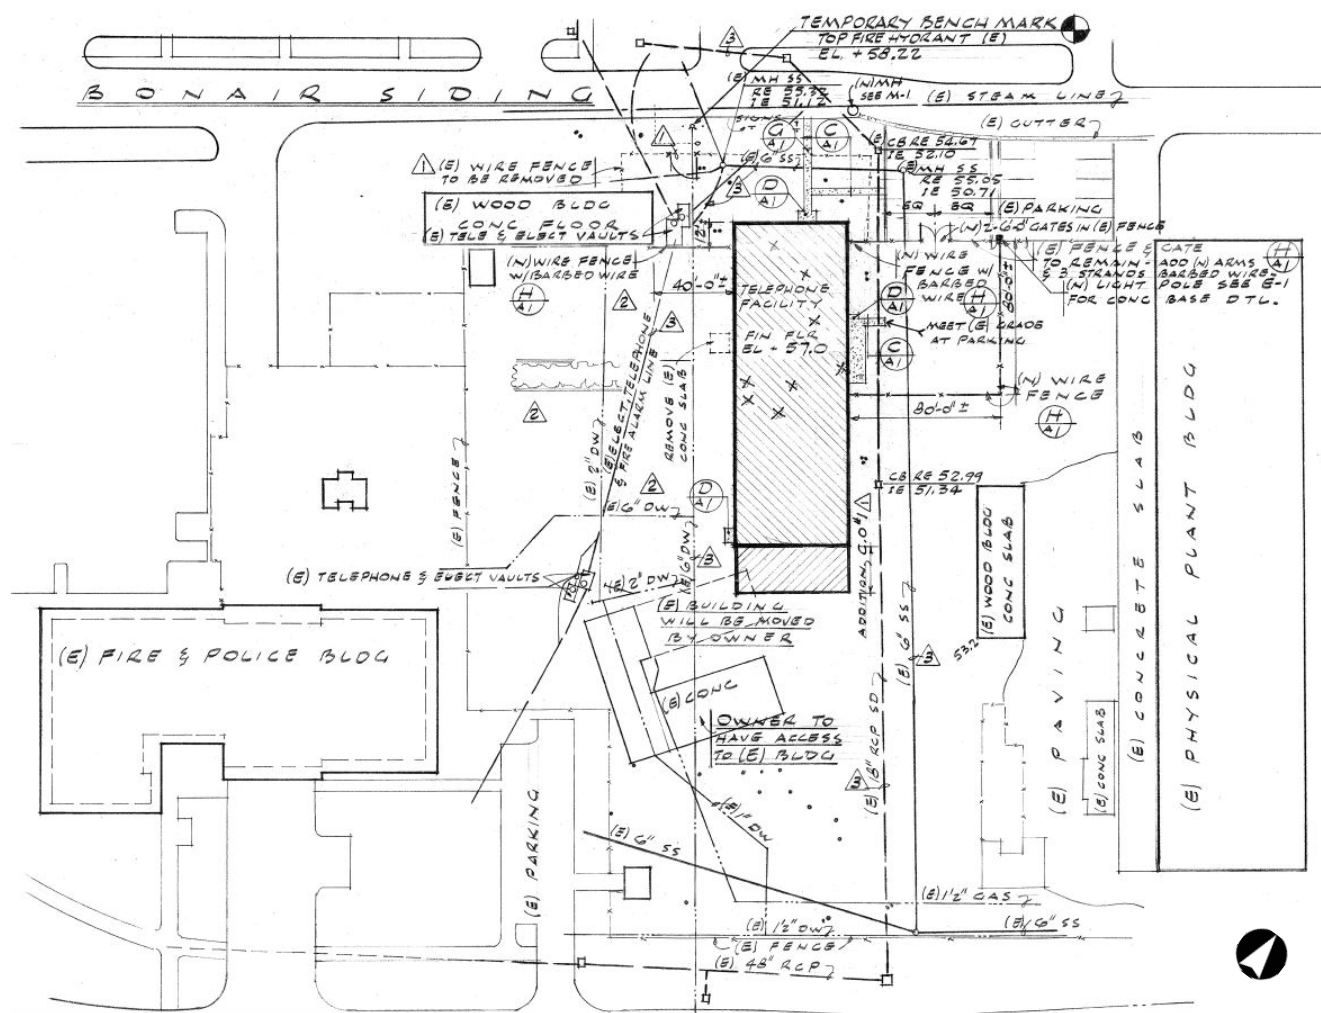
1973 site plan prepared for 333 Bonair Siding Road project labeled as the Telephone Facility by Keller & Daseking. The site plan shows that the preexisting greenhouse building, located to the immediate southeast of 333 Bonair Siding Road had been partially demolished between 1965 and 1973. Source: Stanford University LBRE.
